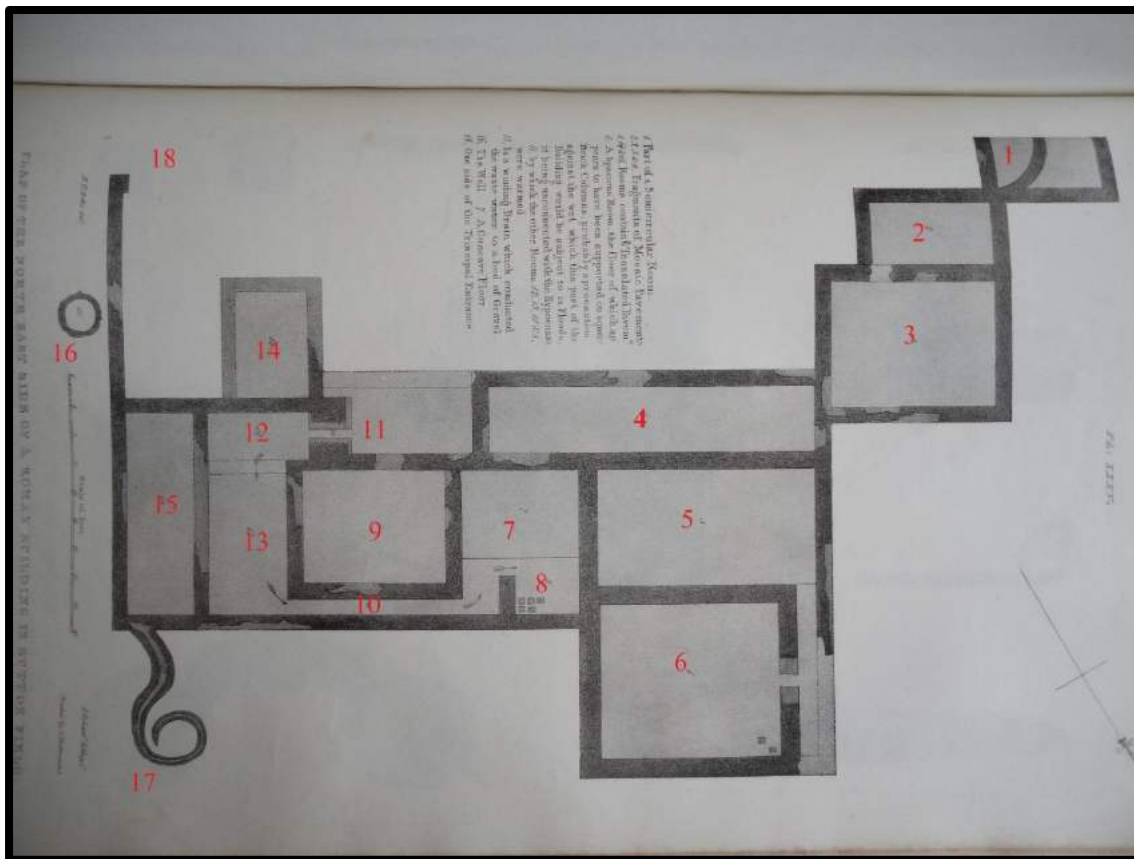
The plan of the Roman villa (Site 2.1) by E.T. Artis (1828 Plate XXXV).
